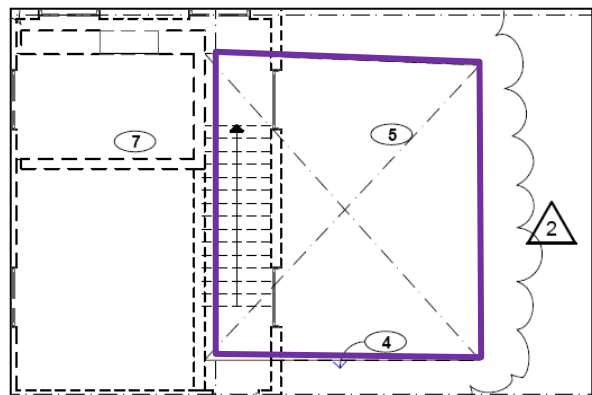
Roof Slab Demolition Plan, Courtesy of Core Architects
